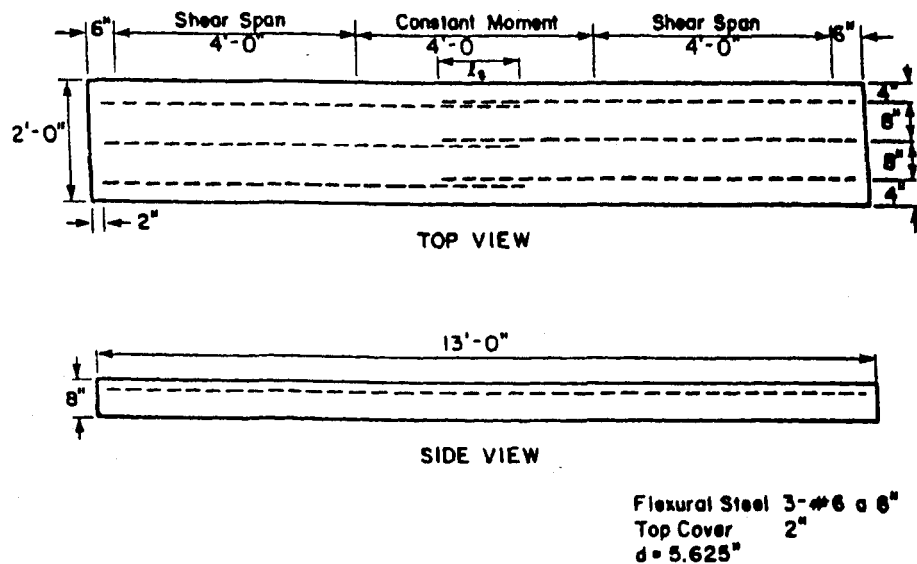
Shallow specimen details (Cleary and Ramirez 1989)
